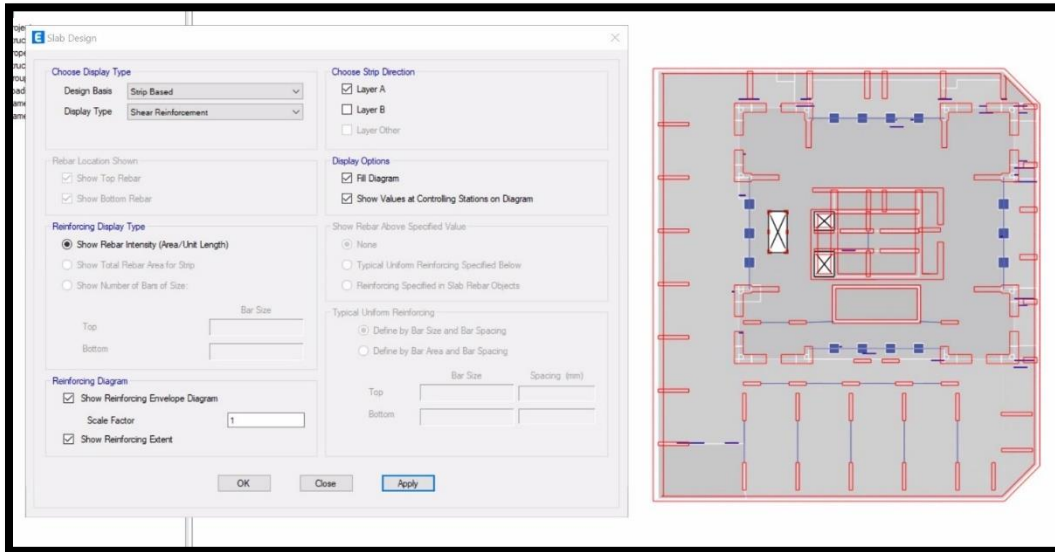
Shear Reinforcement in X-Direction for 4th Basement Floor
